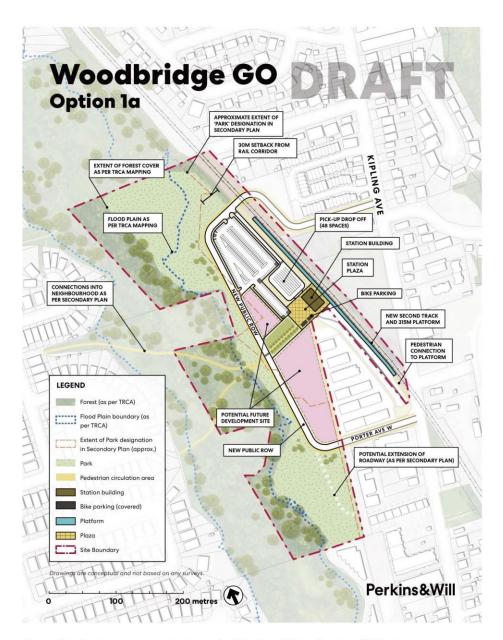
Option 1a conceptual plan for Site 1 and Woodbridge GO Station
